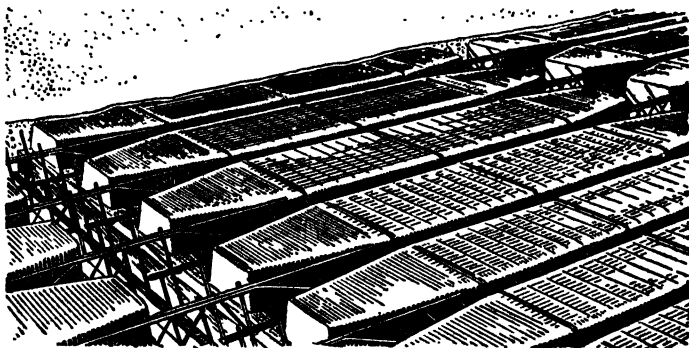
Metal Pans Alternating with Concrete Ribs—Tapered Type
